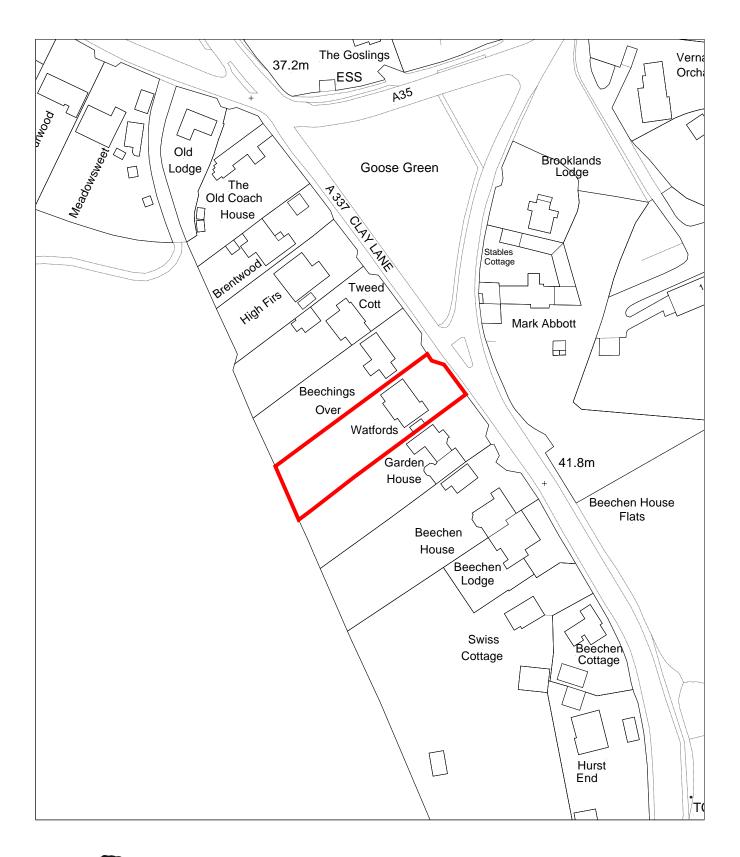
J30 A103A (Proposed Location & Block Plans) KA 2024 J30 A104A (Proposed Floor Plans) KA 2024 J30 A105A (Proposed Roof Plan) KA 2024 J30 A201A (Proposed Elevations) KA 2024 J30 A202 (Street Scene), KA 2024 J30 A300 (Shadow Diagram)
